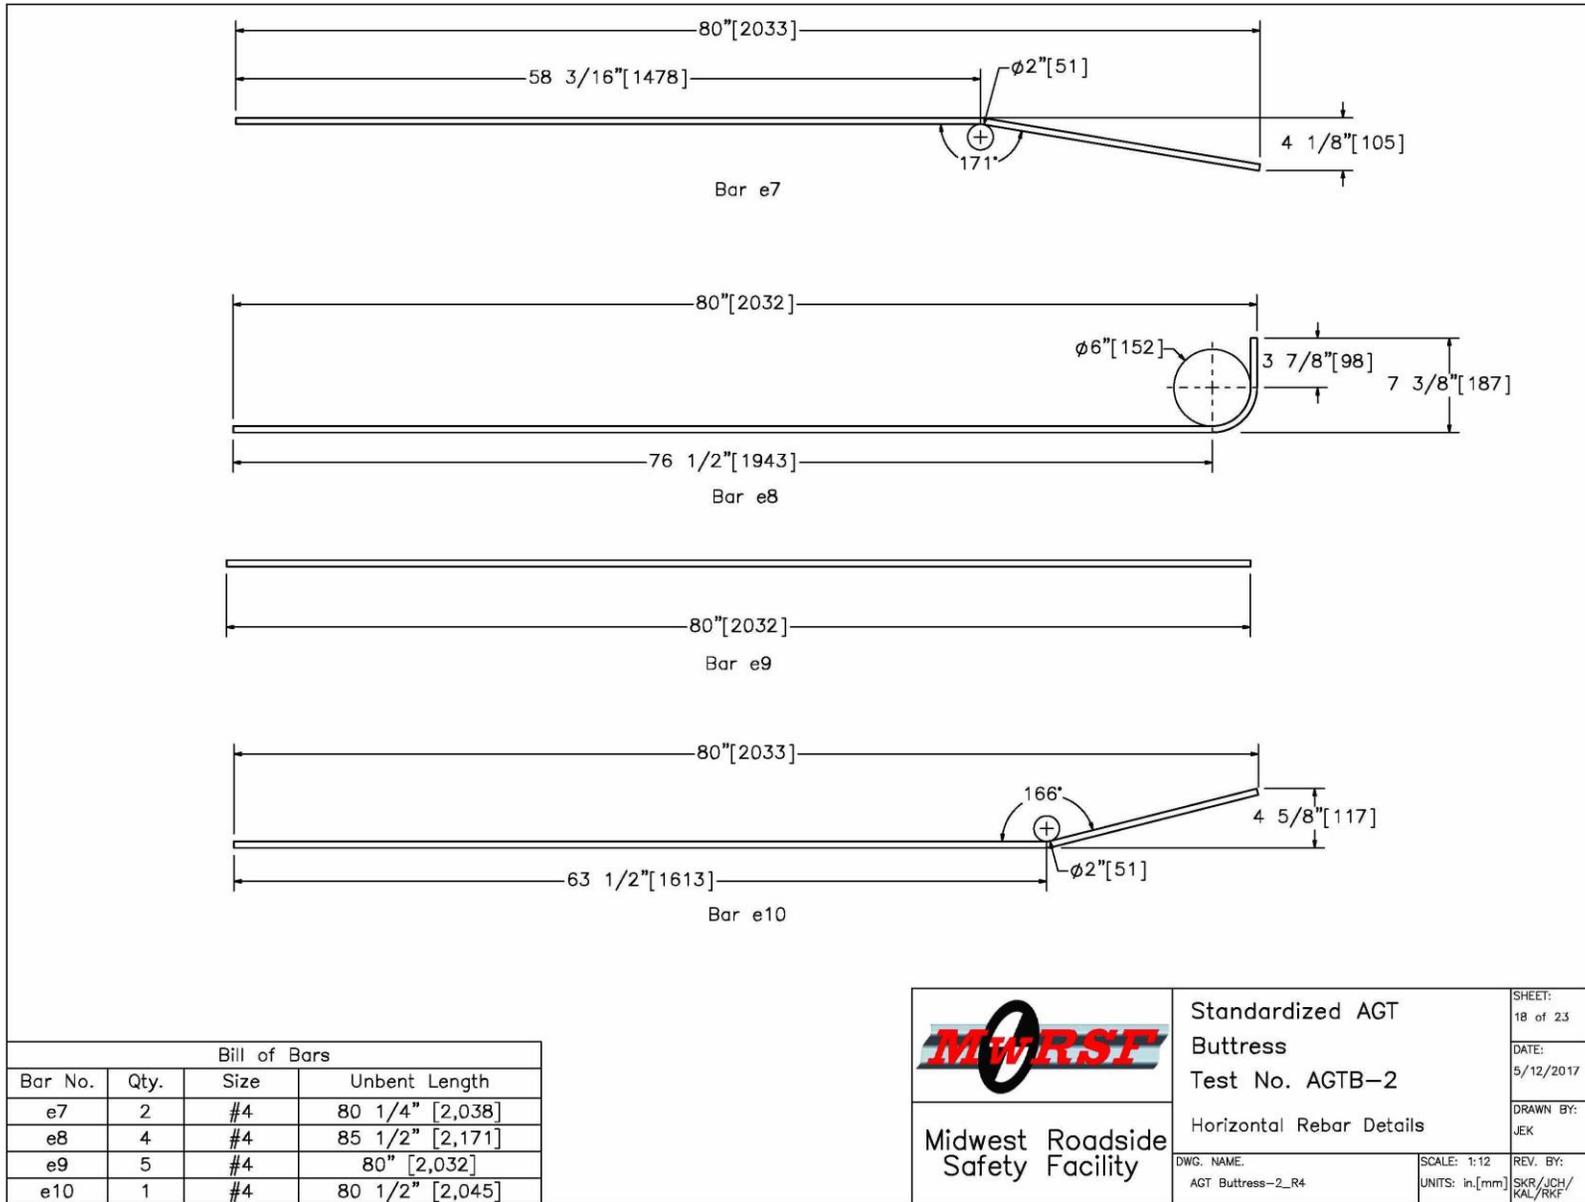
Horizontal Rebar Details, Test No. AGTB-2
